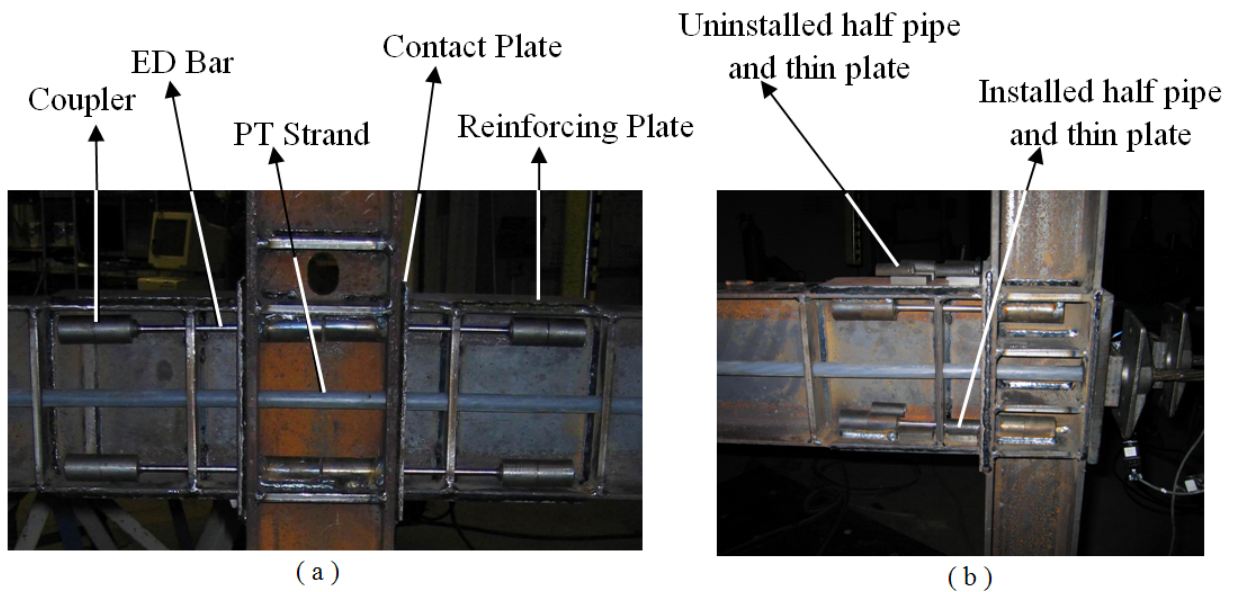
SCPT beam-column connections (a) interior connection (b) exterior connection
